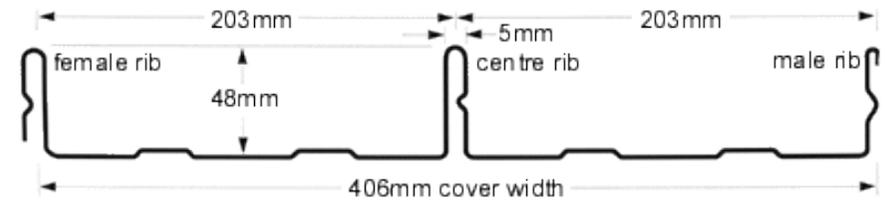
cross section of Brownbuilt roof sections (Brownbuilt 2007)
